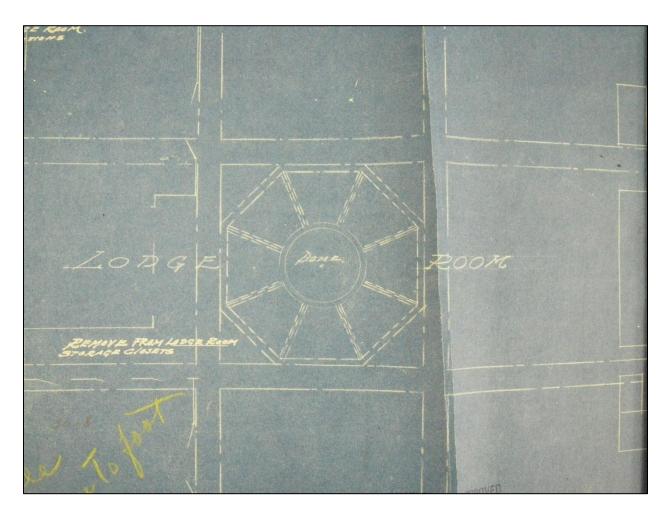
Note the beamed ceiling and oculus in the former ballroom space, from E.C. Haley's 1920 drawing set. Source: Northwest Architectural Archives, University of Minnesota.
